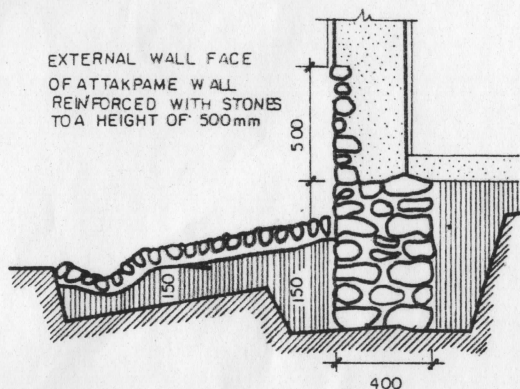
Stone foundation suitable for attackpame or sun-dried brick or adobe ; with apron of stones set in sand/clay/bitumen mortar on top of 150 mm thick well-rammed laterite below eaves overhang (after ref 11)
